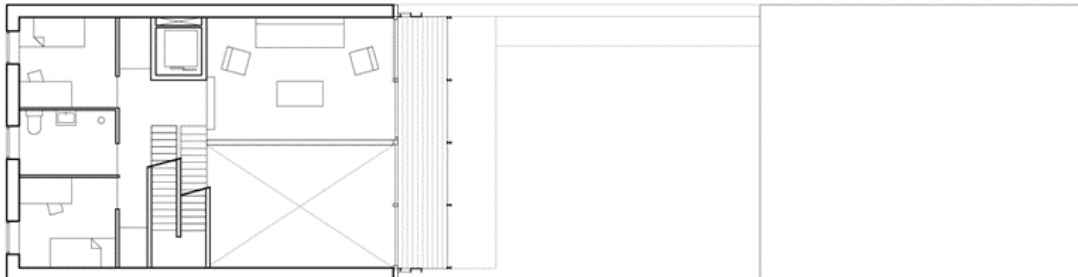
First floor plan. Photo by BETA Architects (www.beta-office.com/project/3-generation_house)
